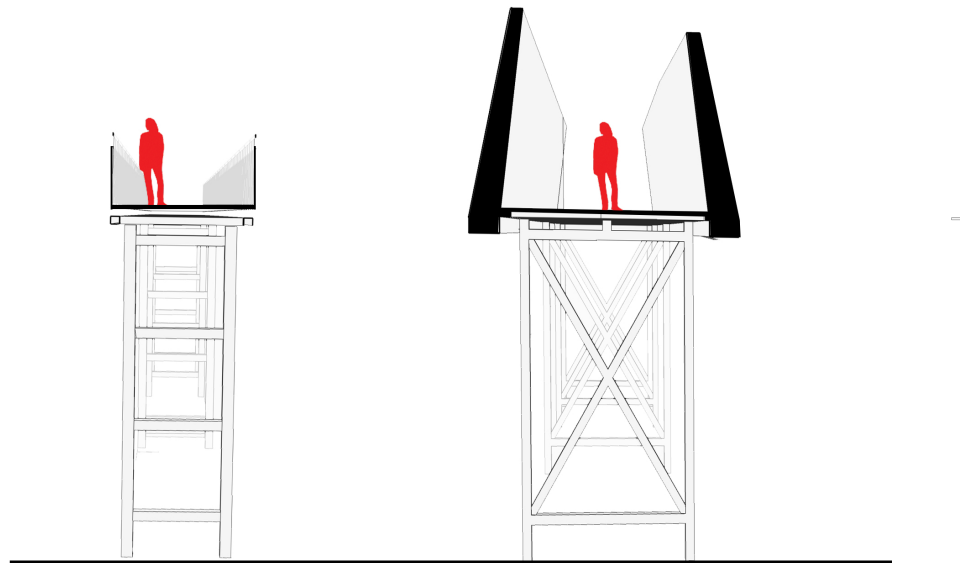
Pedestrian bridge linkage B - existent and proposed *author's work
